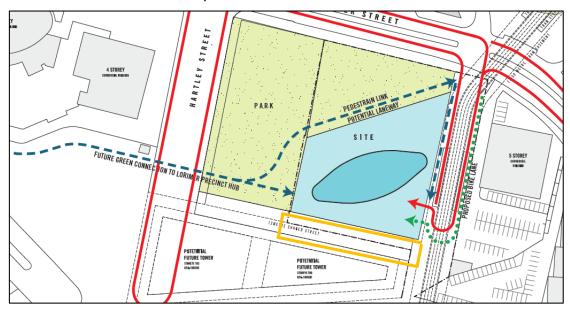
Site plan for TPM-2014-19(/A) (new road shown in orange rectangle) (95 Lorimer Street shown as 'Park')
